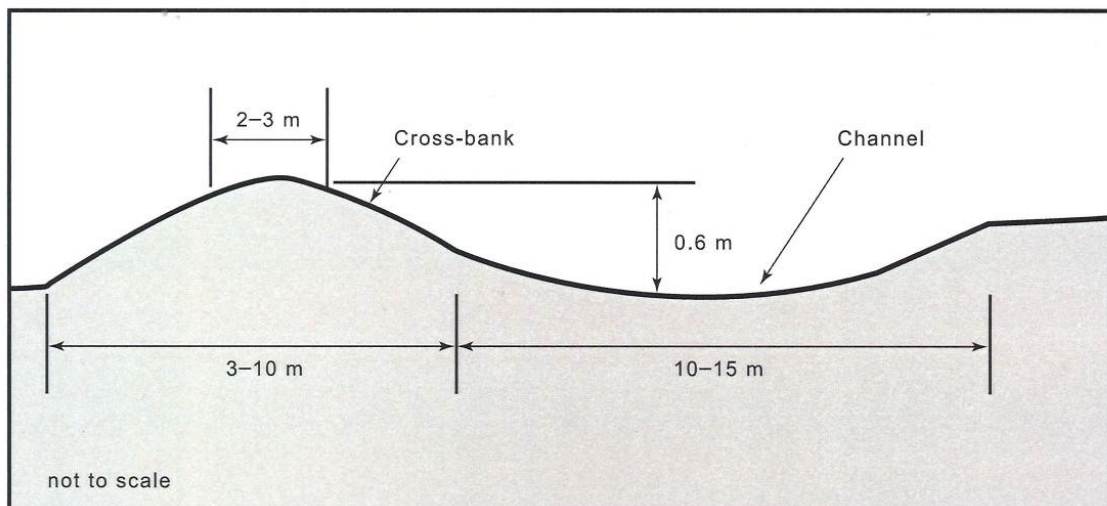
Cross bank dimensions (Source: Managing Urban Stormwater; Soils and Construction – Volume 2C Unsealed Roads)
